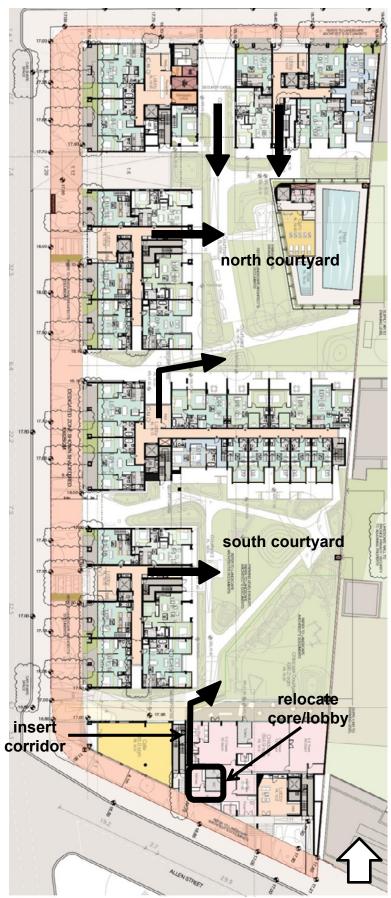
Ground floor plan showing direct access to communal courtyards as recommended through design modification conditions.
